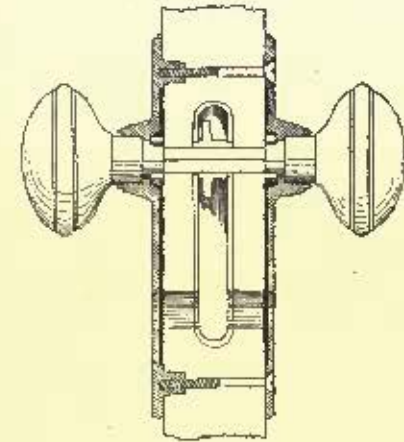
Screwless Door-knob and Escutcheon combined. Russell & Erwin.
